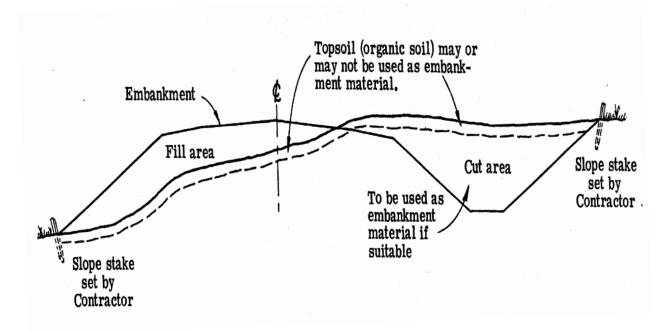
Cut and fill areas showing excavation and embankment construction.
